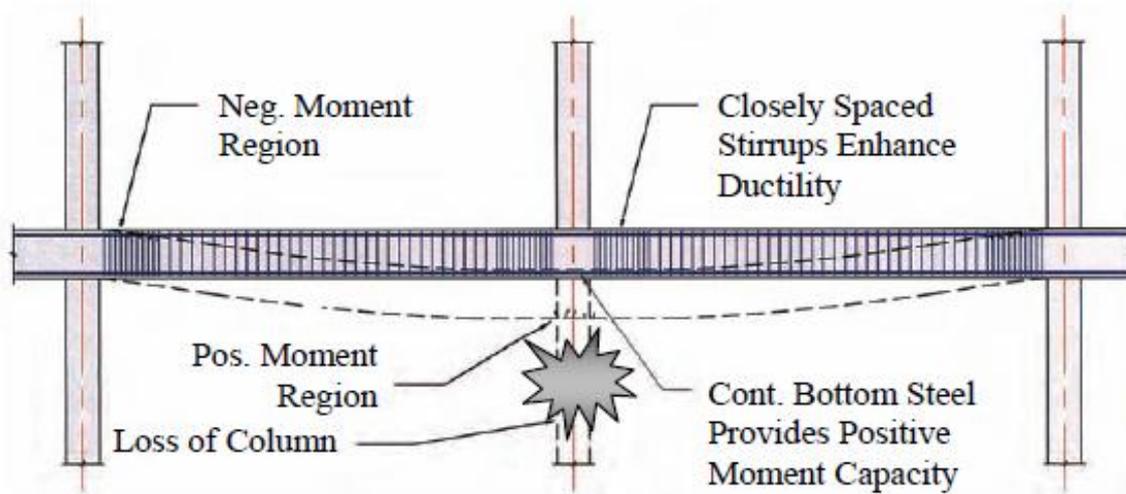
Detailing of reinforcing steel for potential loss of a supporting column
